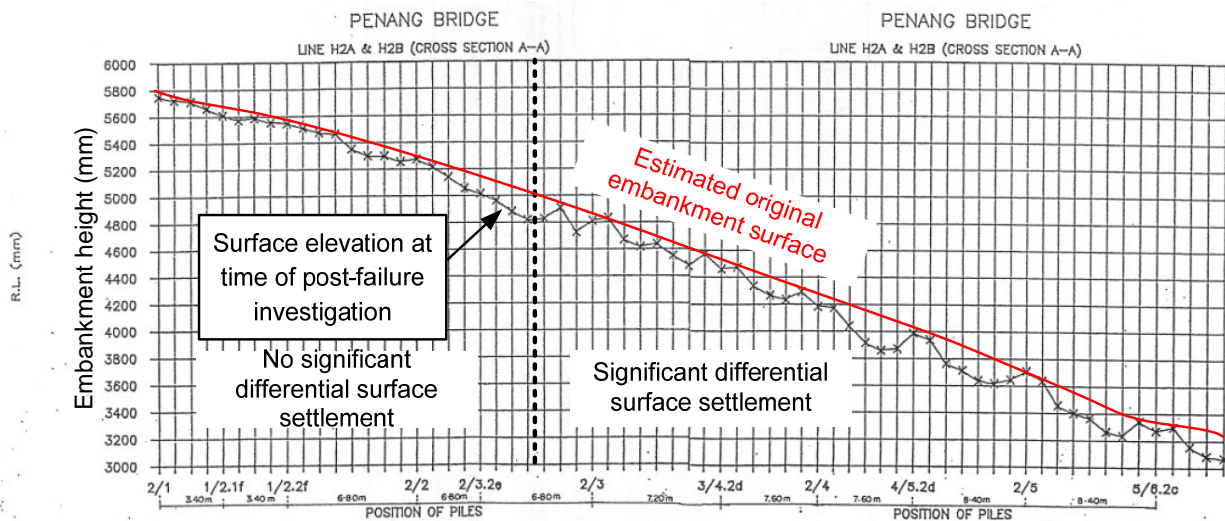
Surface settlements along profile of failed column-supported embankment (adapted from Ting et al. 1994, fair use)
